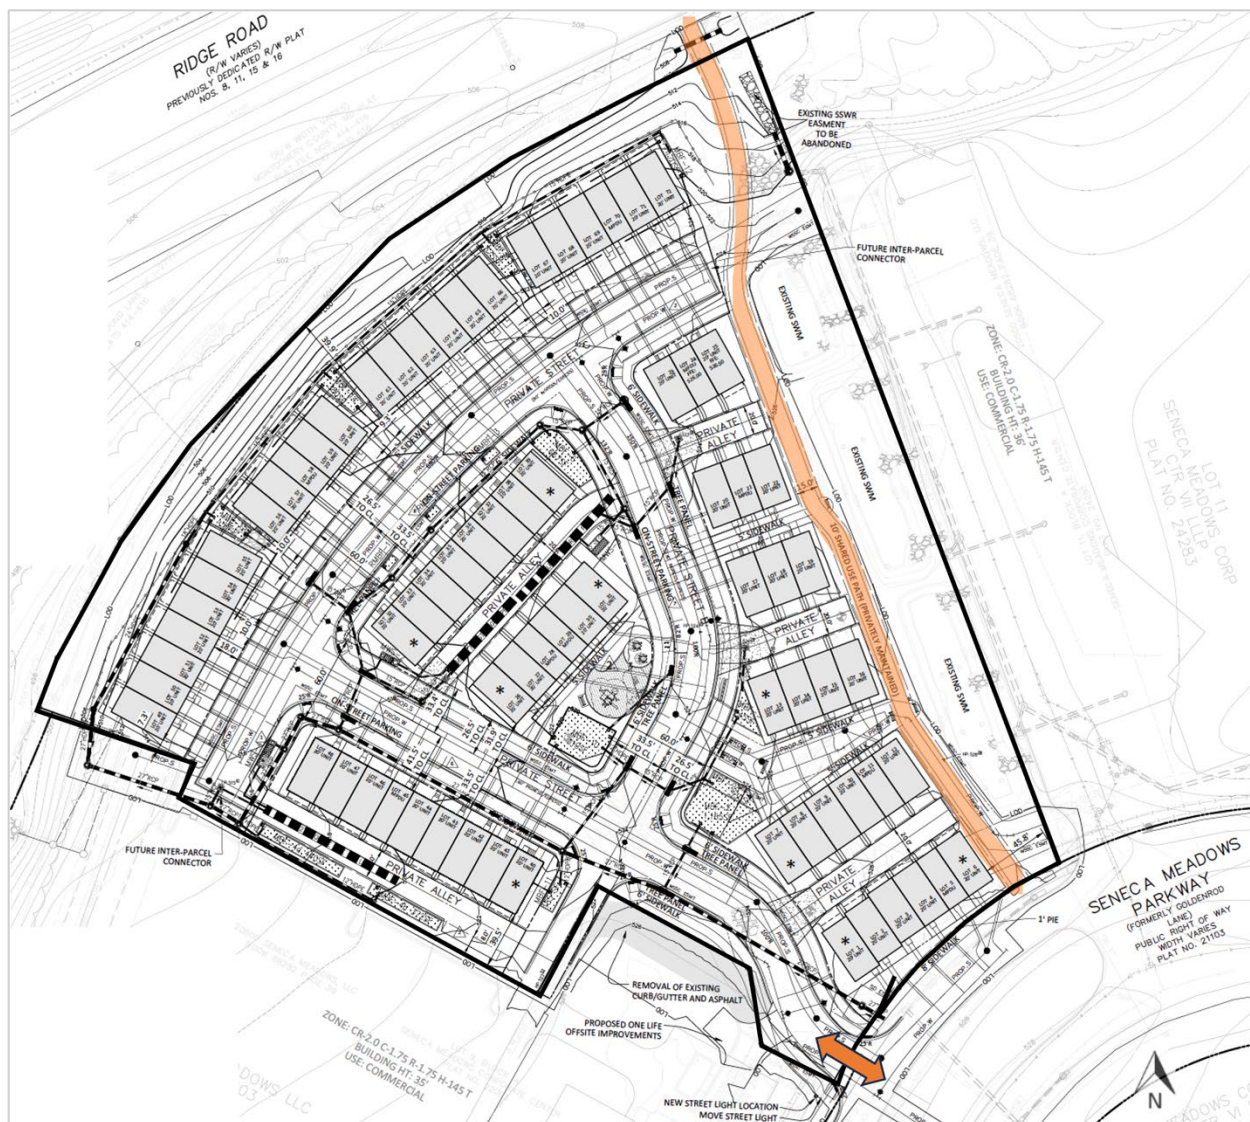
Proposed Preliminary Plan Amendment showing 72 townhouse lots, private road access from Seneca Meadows Parkway, and a shared-use path between Ridge Road and Seneca Meadows Parkway
